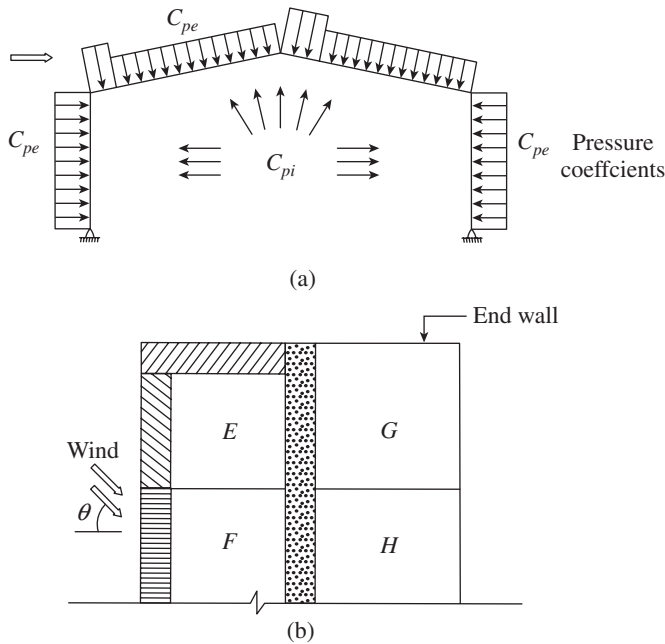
Typical industrial building elevation along with the wind pressure coefficients (a) Typical elevation with wind pressure coefficients C_{pe} and C_{pi} (b) Half plan
